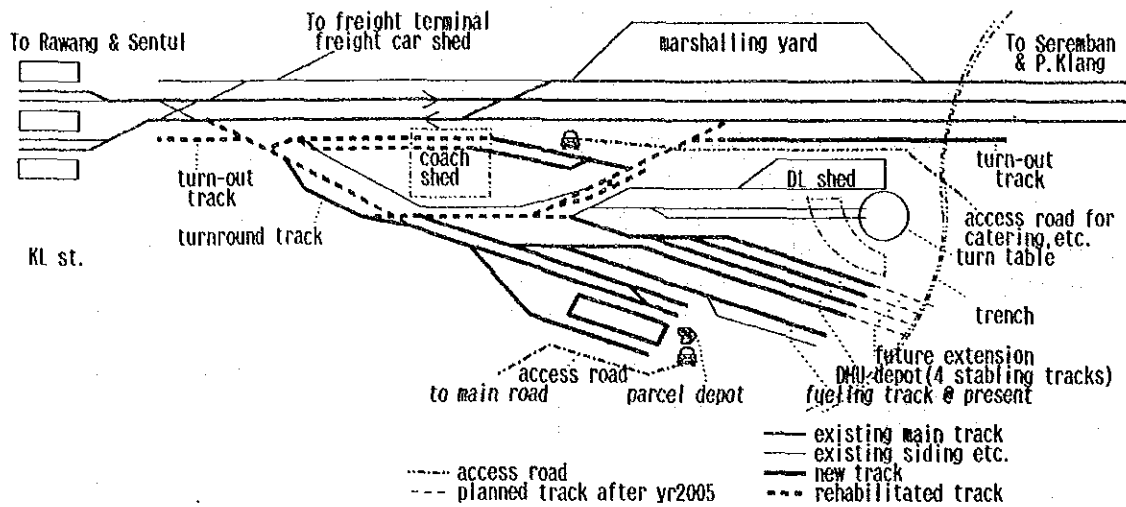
Track Layout of Brickfield Complex in RBCS
